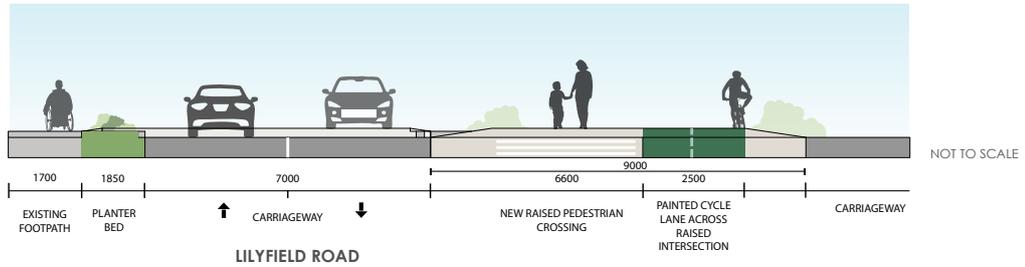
Section B-B: Route 1 | Lilyfield Road at Catherine Street, looking east
